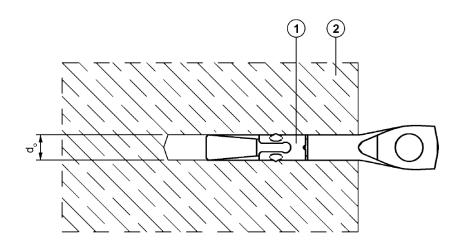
Fastening made with use of a TT-THROUGHBOLT steel expansion fastener of TWH version
